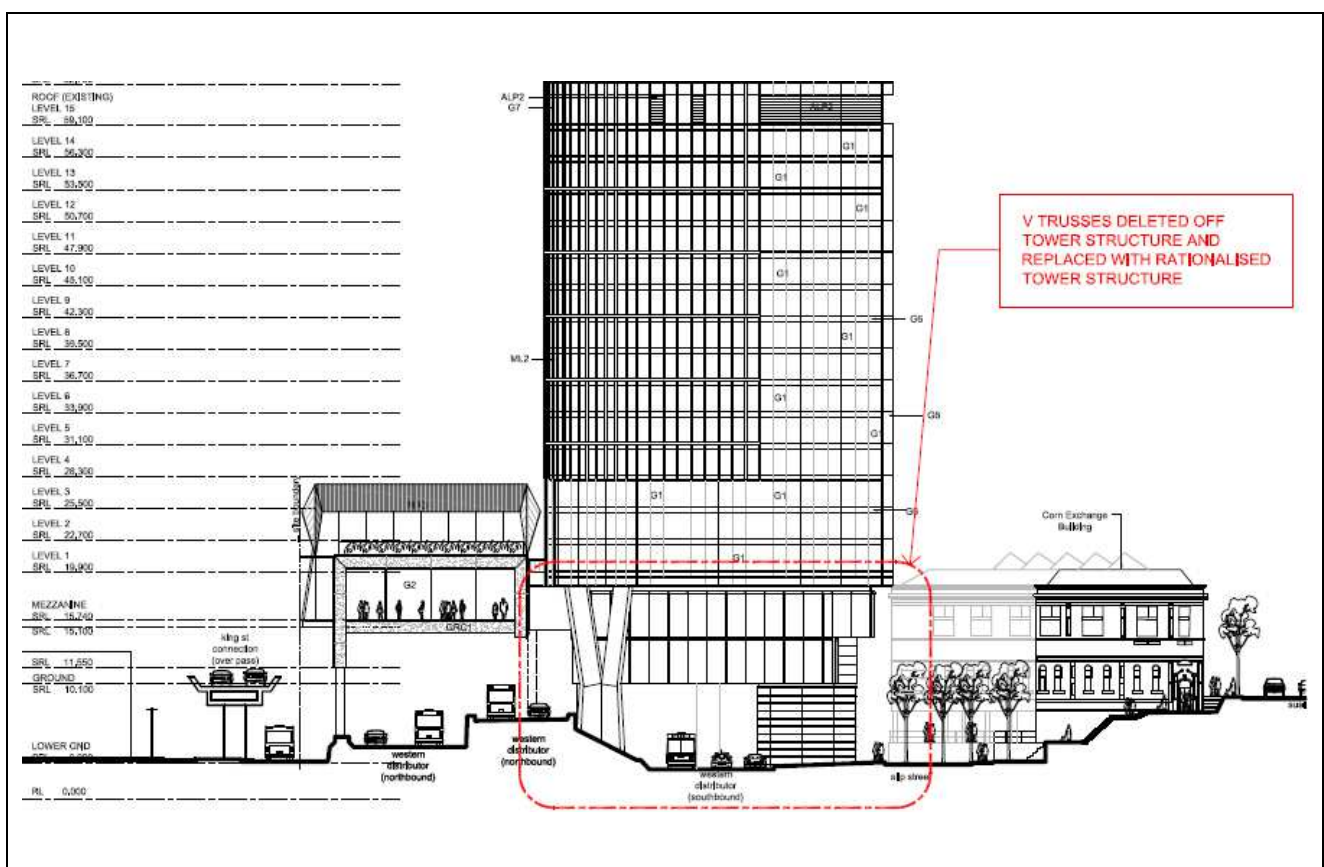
Proposed modified structural columns, trusses and footings design under the tower (South Elevation)
